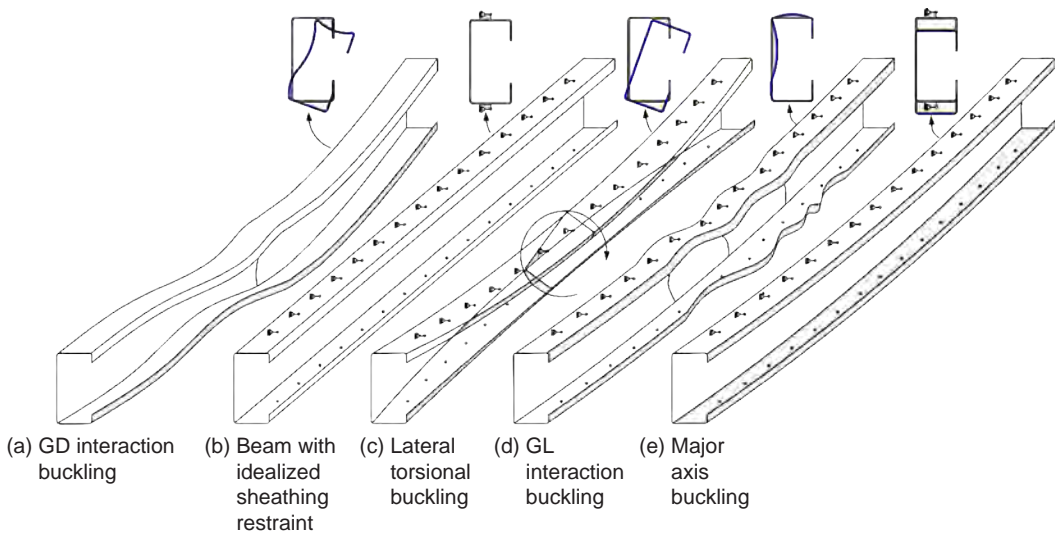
Cold-formed steel structural members subjected to out-of-plane bending - failure modes (GD - global and distortional; GL - global and local)
